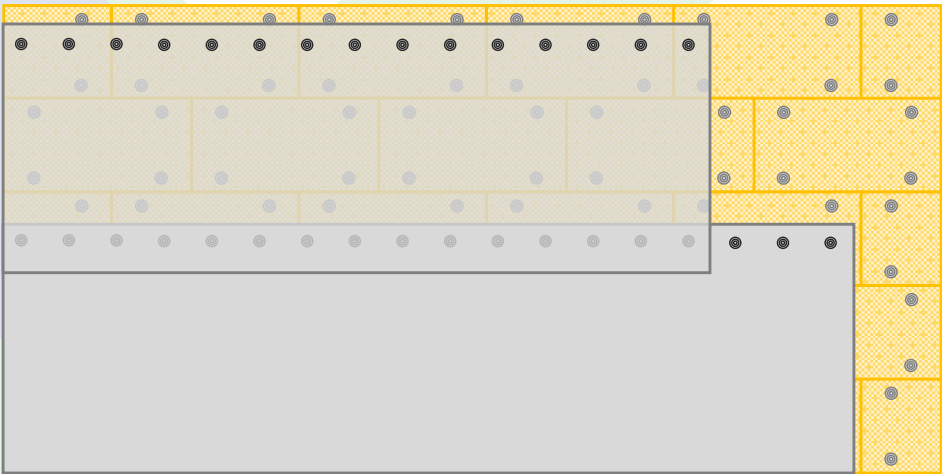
B: MECHANICALLY FASTENING MEMBRANE OVER INSULATION BOARD
